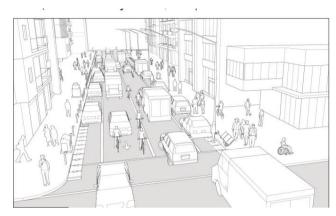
Central one-way street (Bloomberg & Sadik-Khan, 2016)
